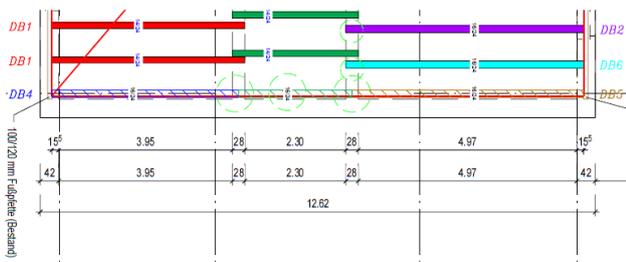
Timber ceiling – section of floor plan (copyright BASYS GmbH Lenzen)
